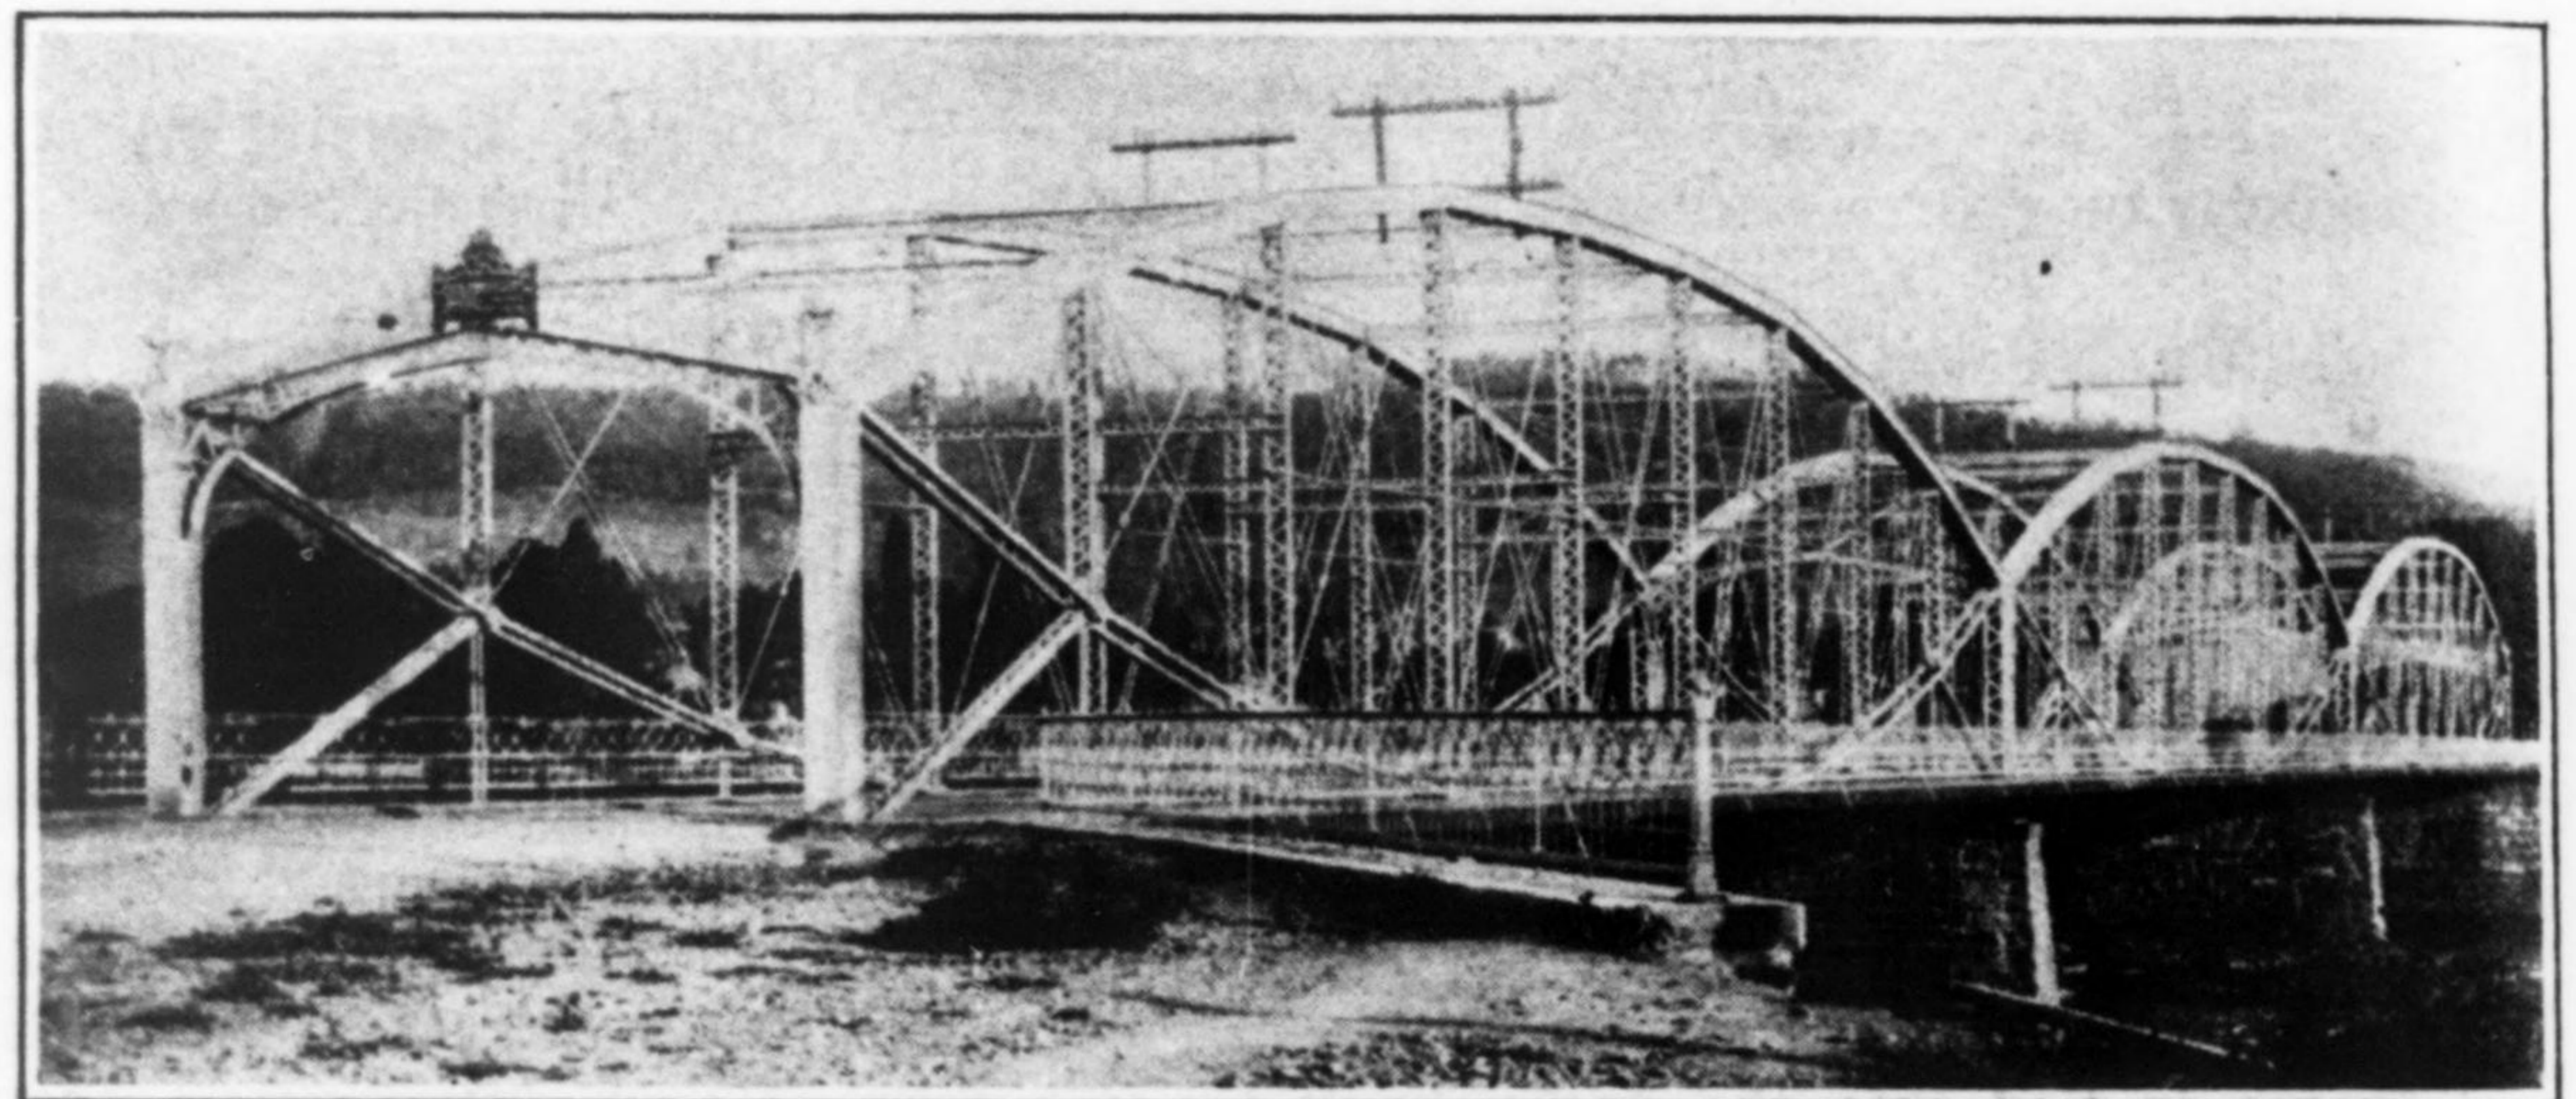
THROUGH PARABOLIC TRUSS BRIDGE AT BINGHAMTON, N. Y., WITH THREE 65-FT. SPANS
